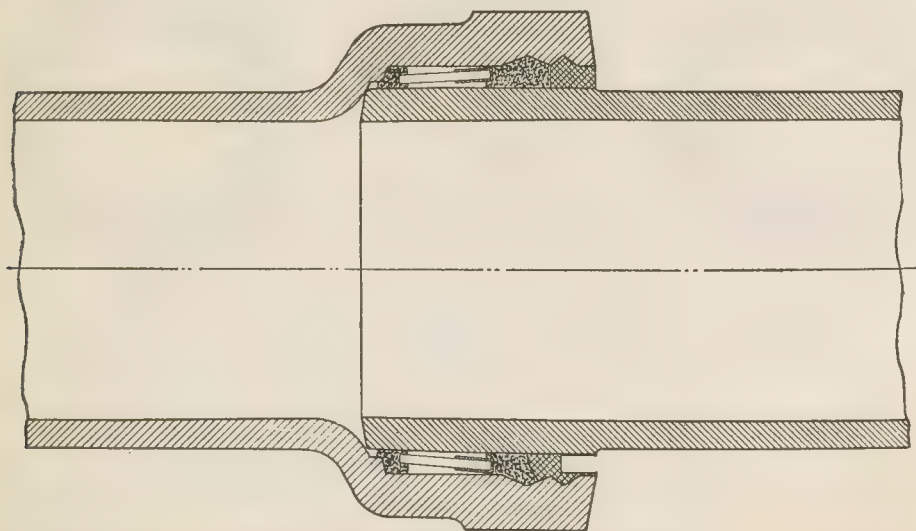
,864.—McWane pre-caulked bell and spigot joint, showing jute packing, lead packing, iron wedges in bell.
